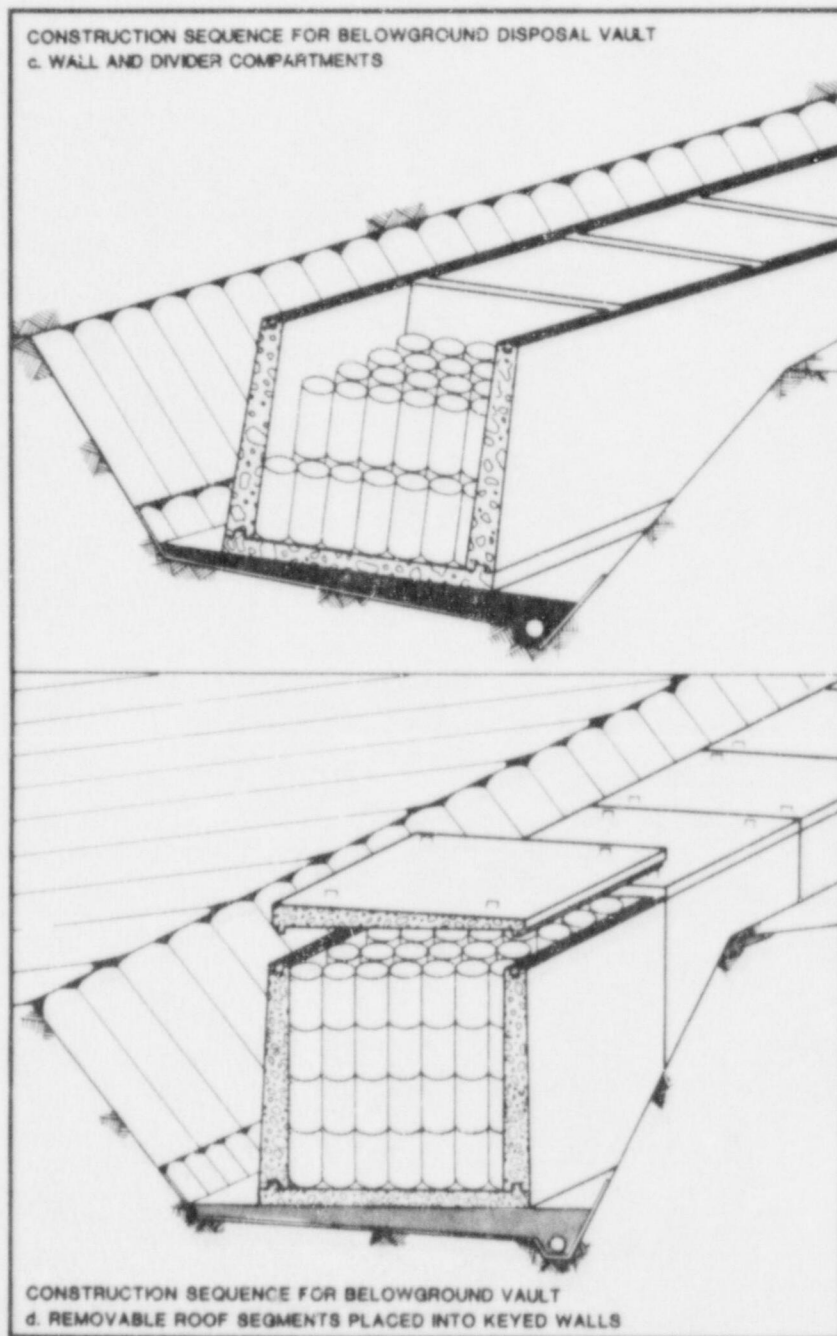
Construction sequence for cut and cover construction of belowground vault LLW disposal units. Figure 5c shows the compartmentalized vaults constructed within the excavation. Figure 5d shows the removable roof segments placed into keyed walls.
